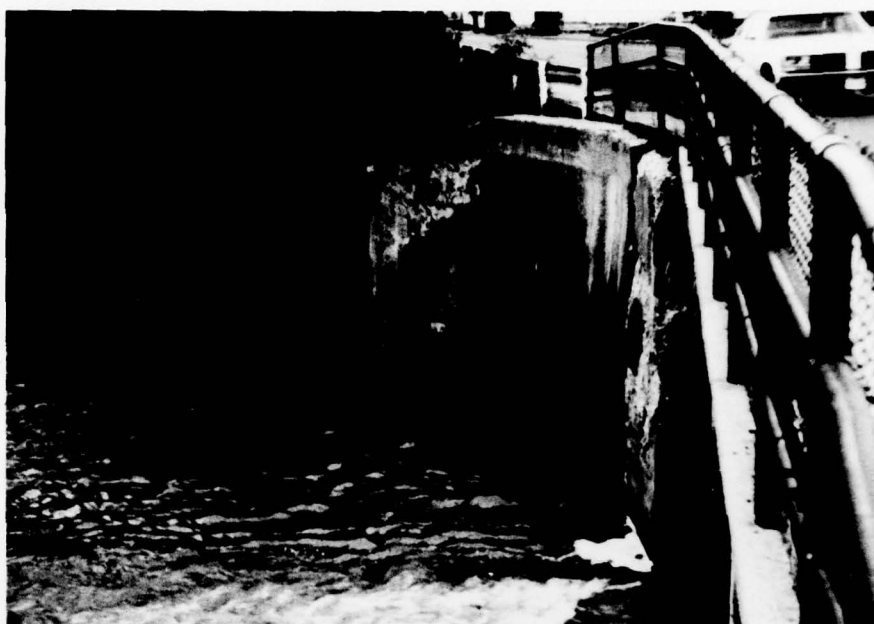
Detail of right downstream retaining wall. Note the deteriorated concrete on the bridge abutment and retaining wall.
